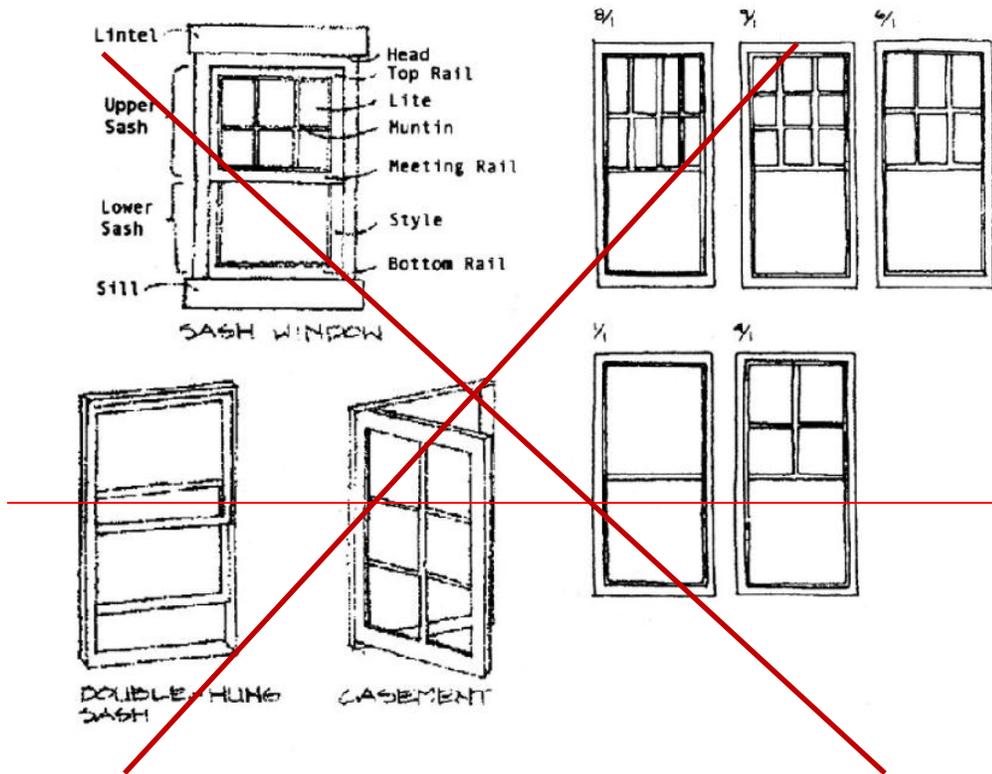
(Referenced in 1.1.3.3(C) 3. Design Detail: Windows)
